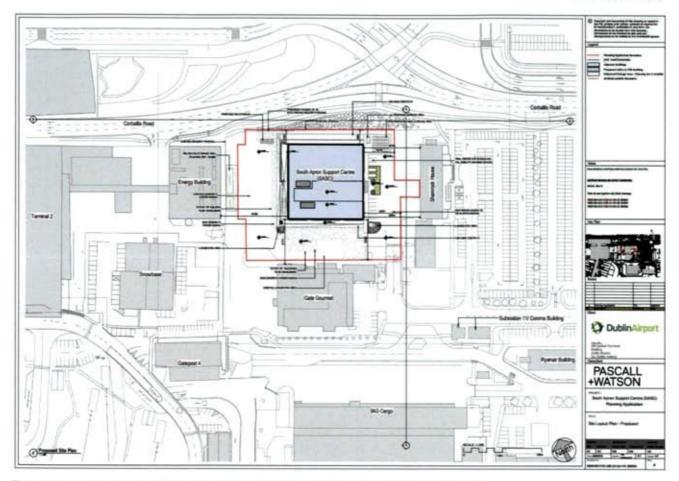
Proposed Site Layout Plan for the South Apron Support Centre
